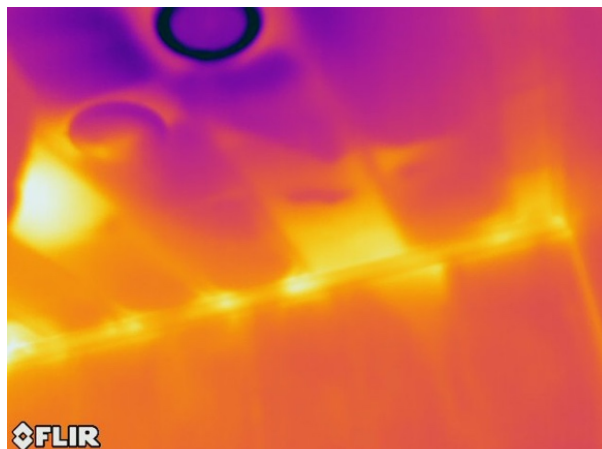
Thermal image of the same room as in Figure 22 which shows missing insulation in the ceiling and on the wall plate (Source: Munsami 2018)
